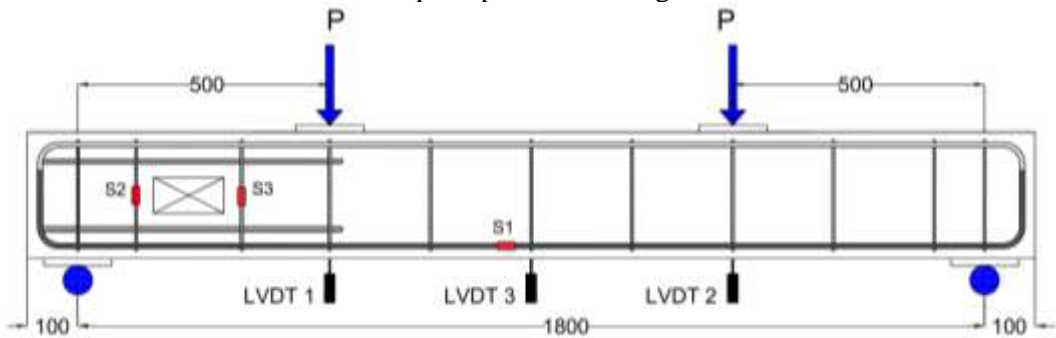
Concrete dimensions, details of reinforcement and strain locations
